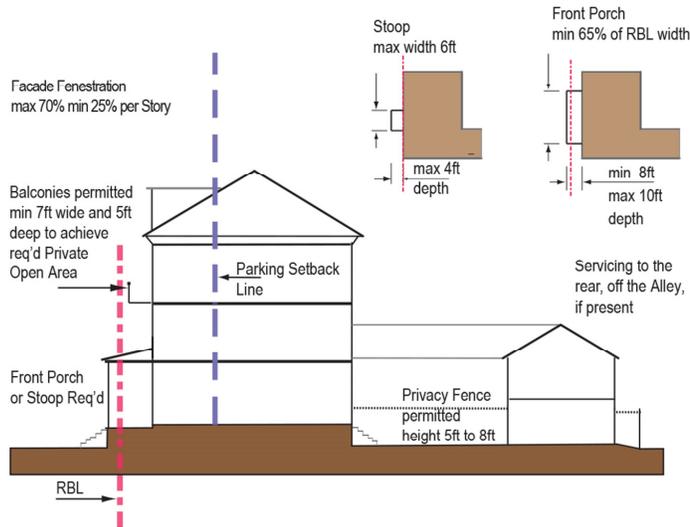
Townhouse/Small Apartment Elements Standards
